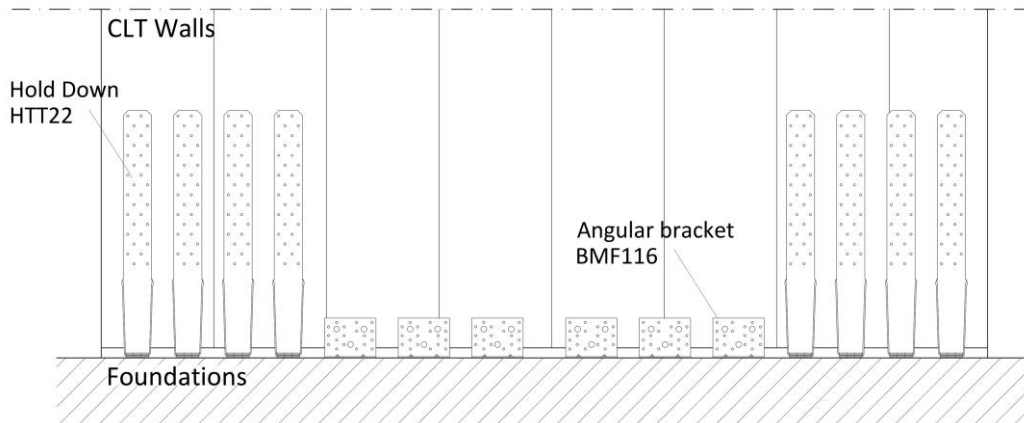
Multiple connectors at foundation level are represented in the drawing on one side of the CLT wall
